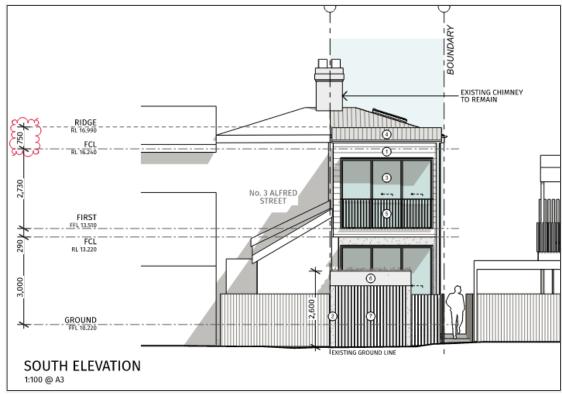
South (rear) elevation of proposed works as seen from rear laneway.
